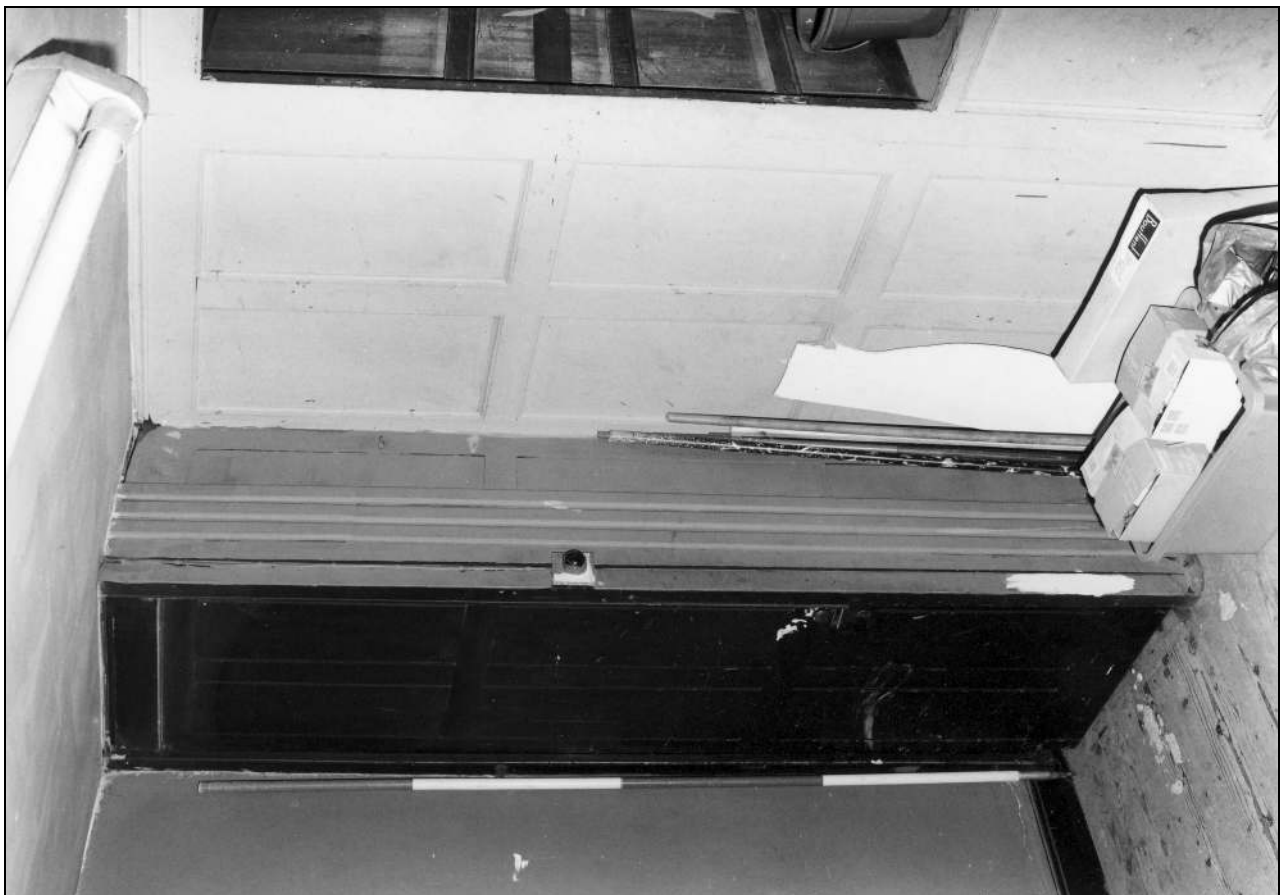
Sunday school gallery: north part, from the north-west (film 4, frame 18)
